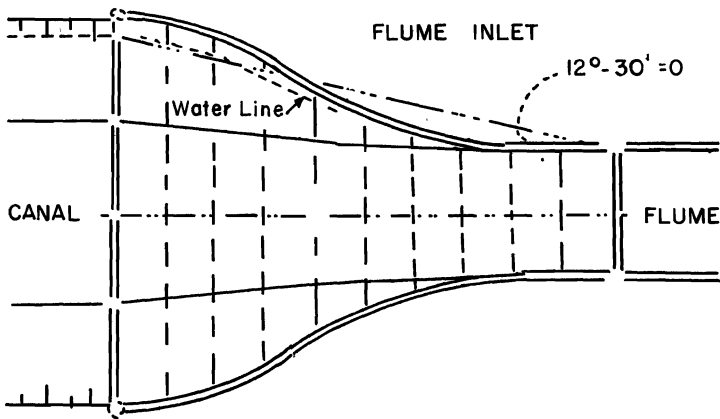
Schematic sketch of plan view of warped wall inlet transition.
